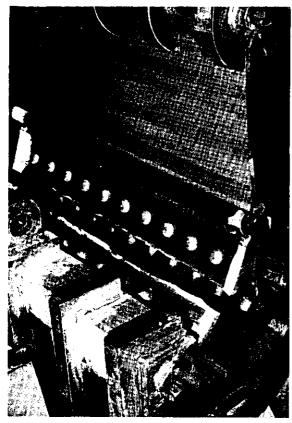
Typical failure mode of "T" connection sheet piles connected by a combination of riveting and welding
